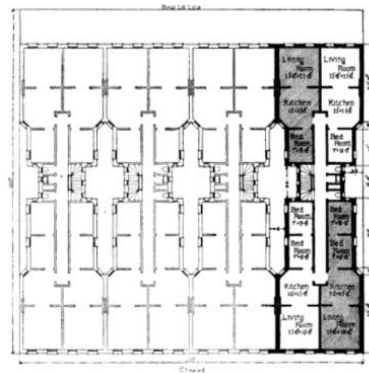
Dumbbell floor plan, tenement house building, New York City, 1894, E Flagg, “The New York Tenement-House Evil and Its Cure.”
